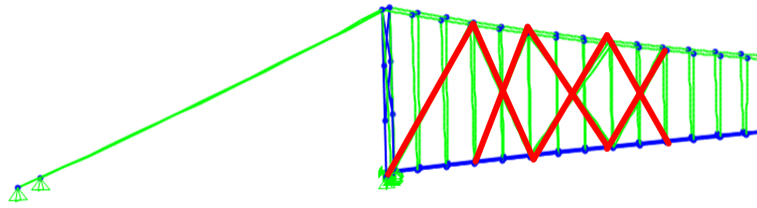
Vertical Bracing Pattern at Ends of 50 m Span Footbridge
